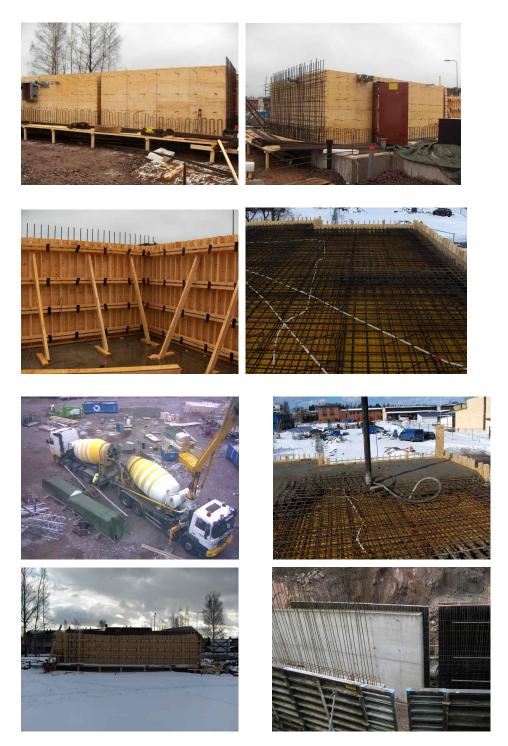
Progress of cast in situ construction from form work to dismantling of forms
